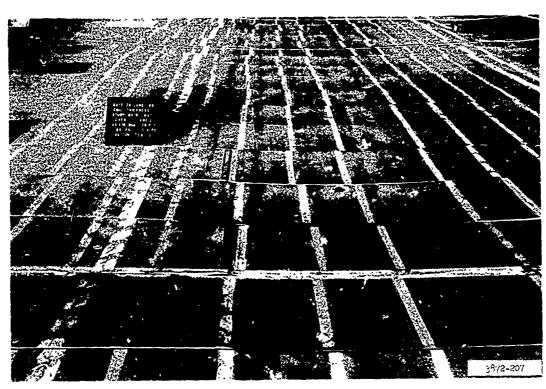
Test section II, lane 2, item 3, prior to traffic
